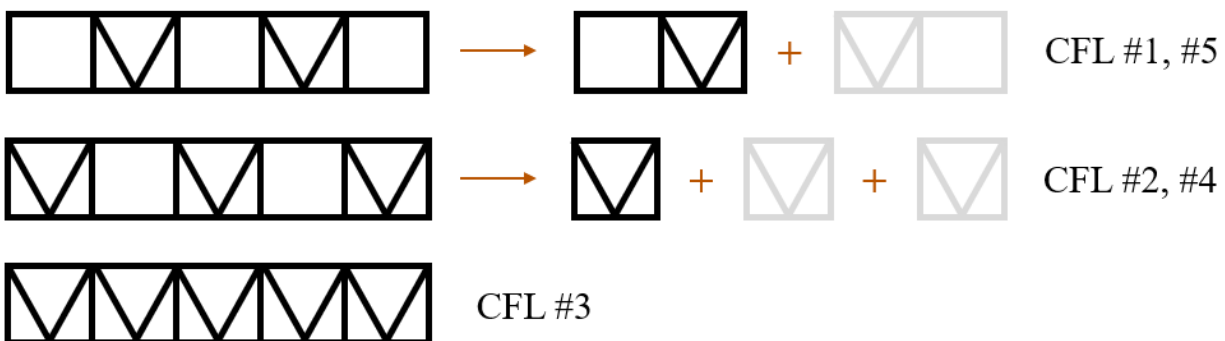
Example 1 Bracing Line Cross-sectional View
